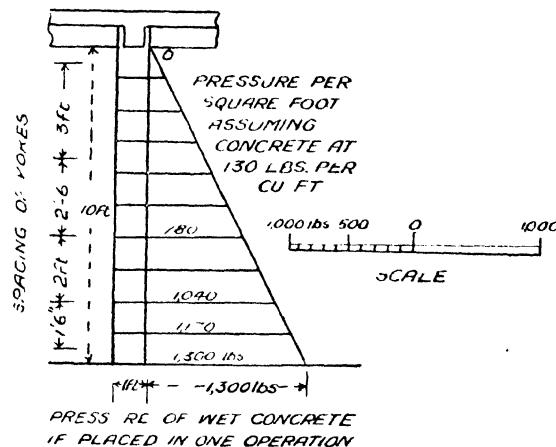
SHOWING PRESSURE EXERTED BY WET CONCRETE
